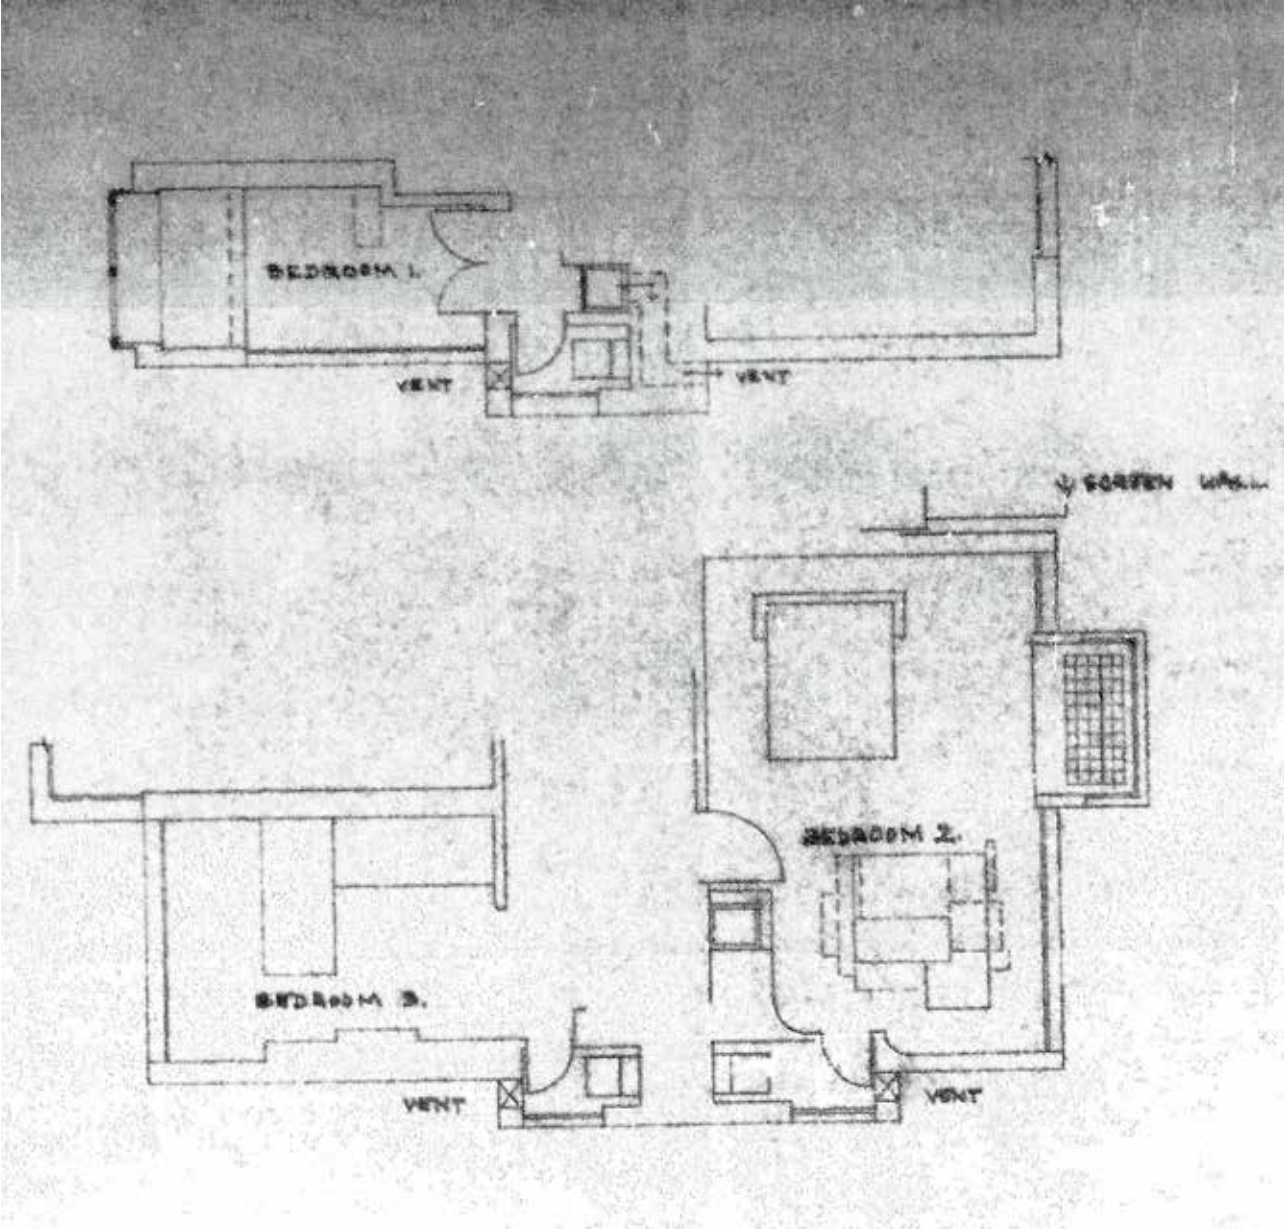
1962 bedroom-level plans (Camden Local Studies and Archive).
